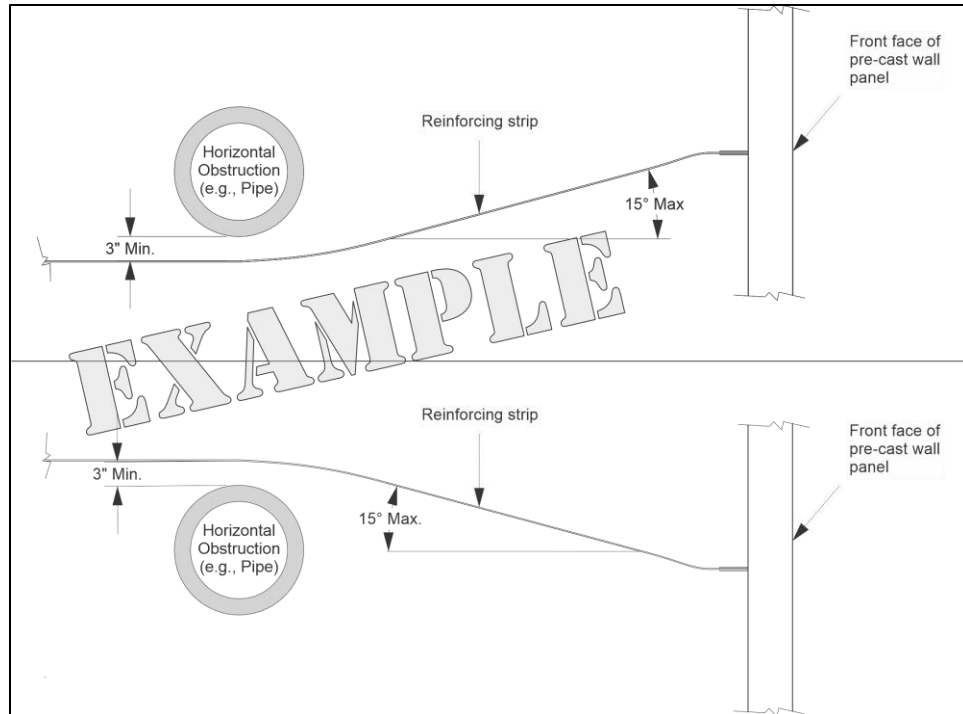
Example shop drawing detailing requirements for placing soil reinforcements to accommodate horizontal obstructions
